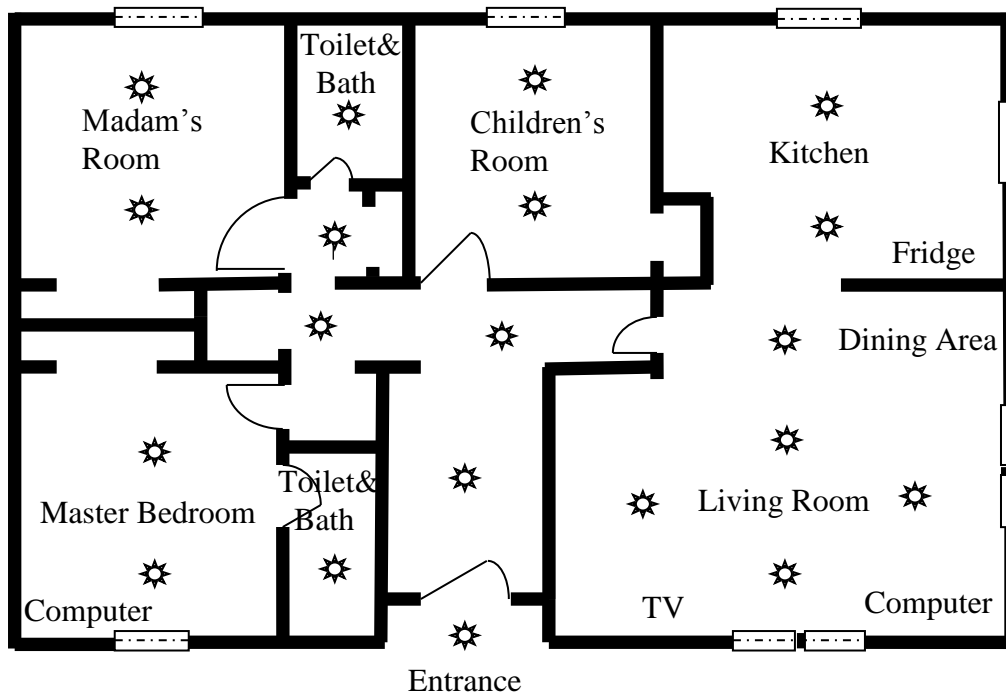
Floor Plan of a Typical 3 Bedroom Bungalow in Bauchi
